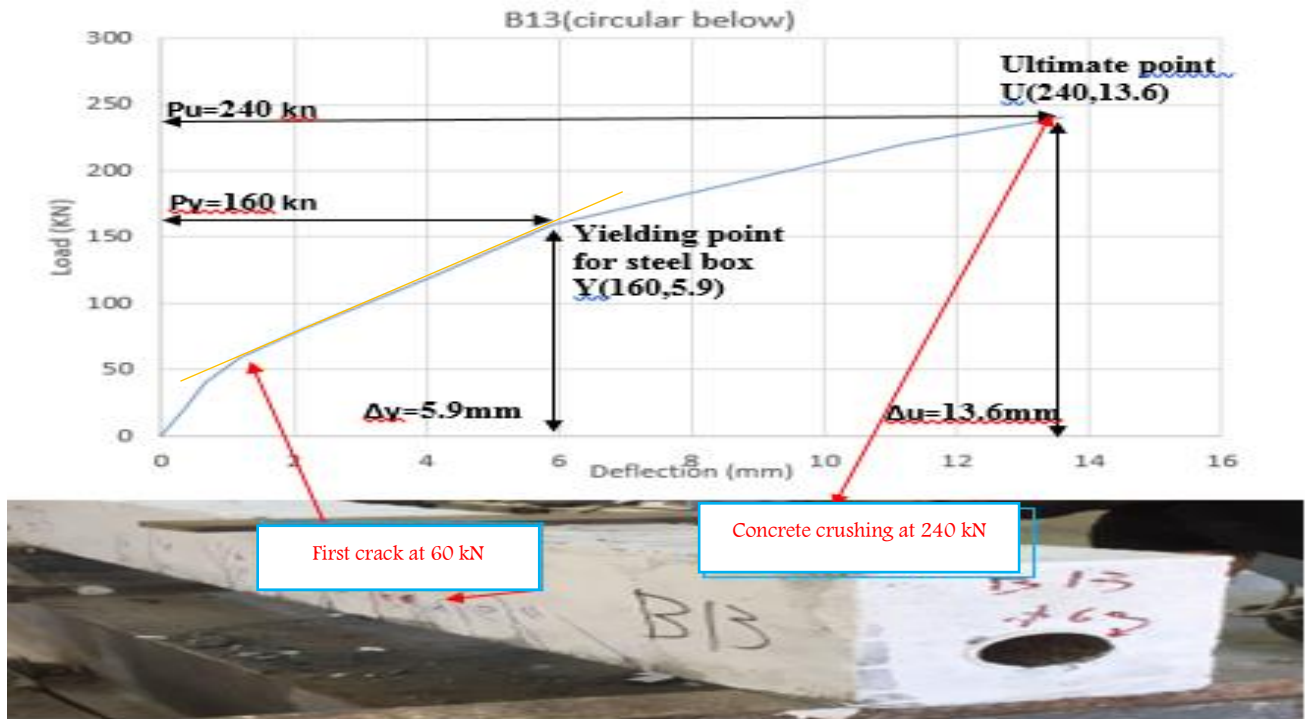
Load-deflection and crack patterns of composite hollow beam B13.
